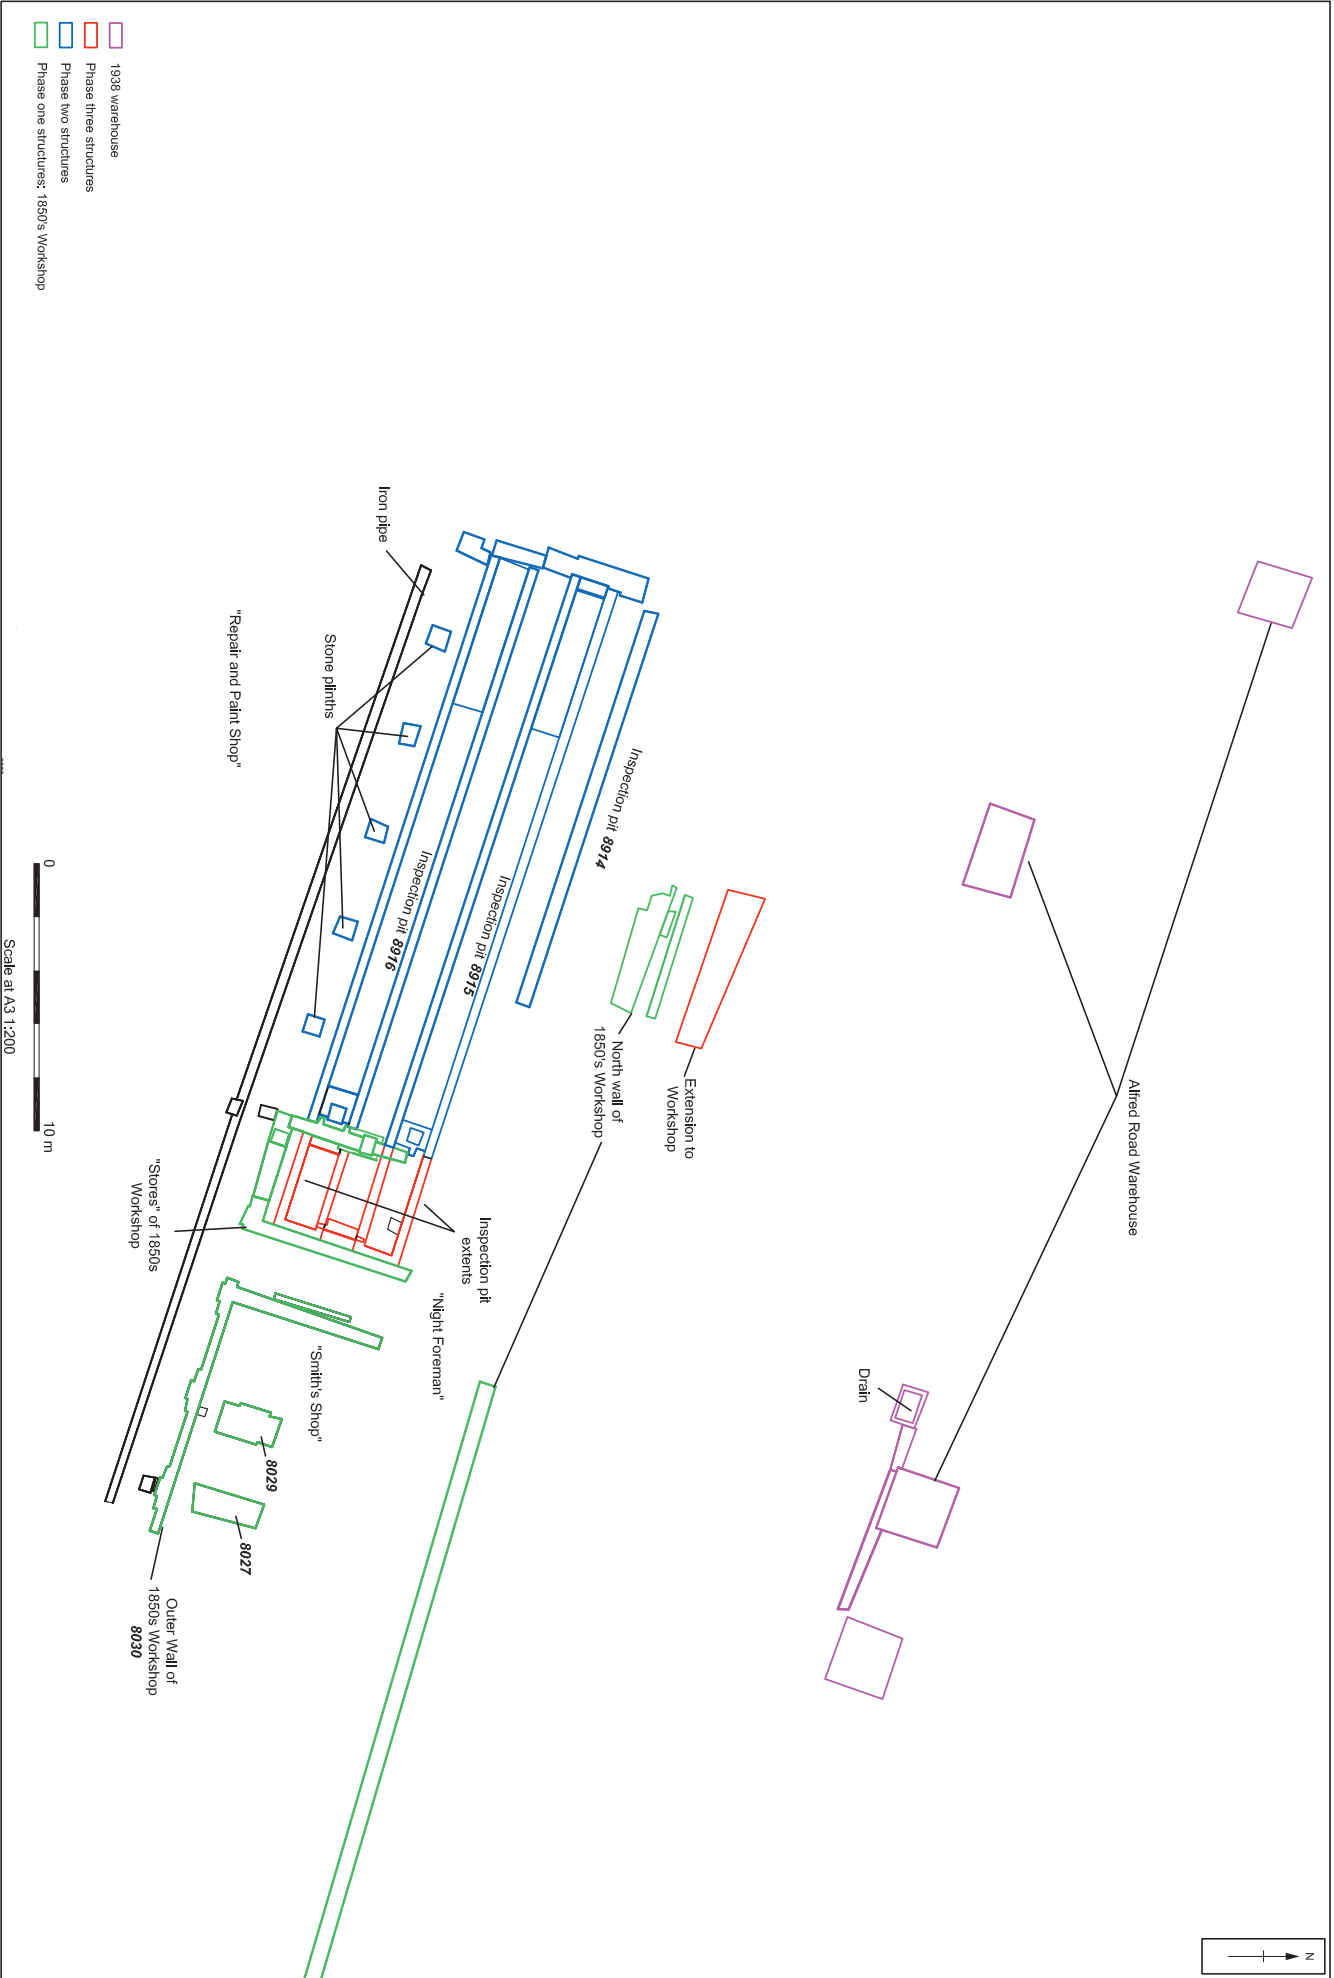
Plan of Workshop (Structure 2) and Alfred Road Warehouse Structure 17
